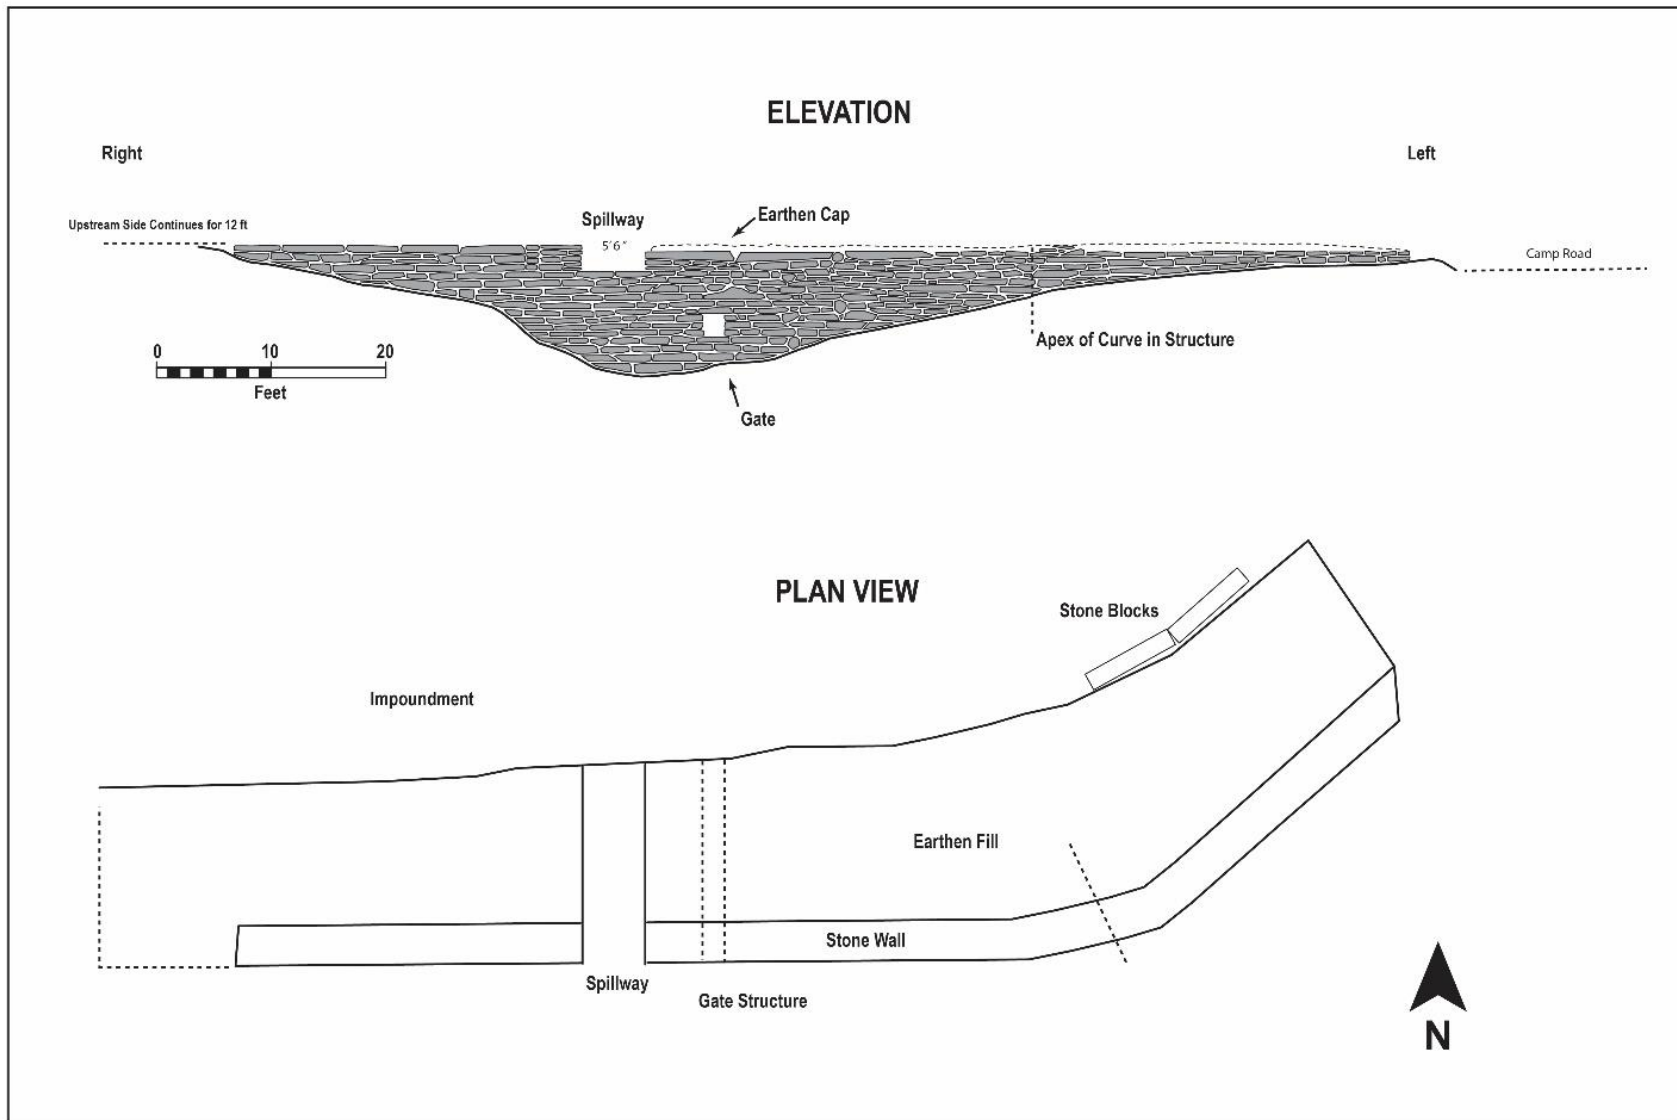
Elevation and plan view of the Curtis Pond Dam, Calais, Washington County, Vermont.
